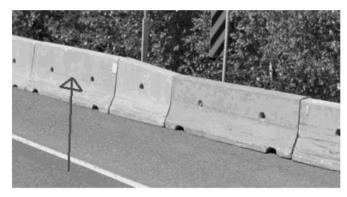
XSP - G - 810mm (32") New Style Concrete Barrier - with Lifting Holes
